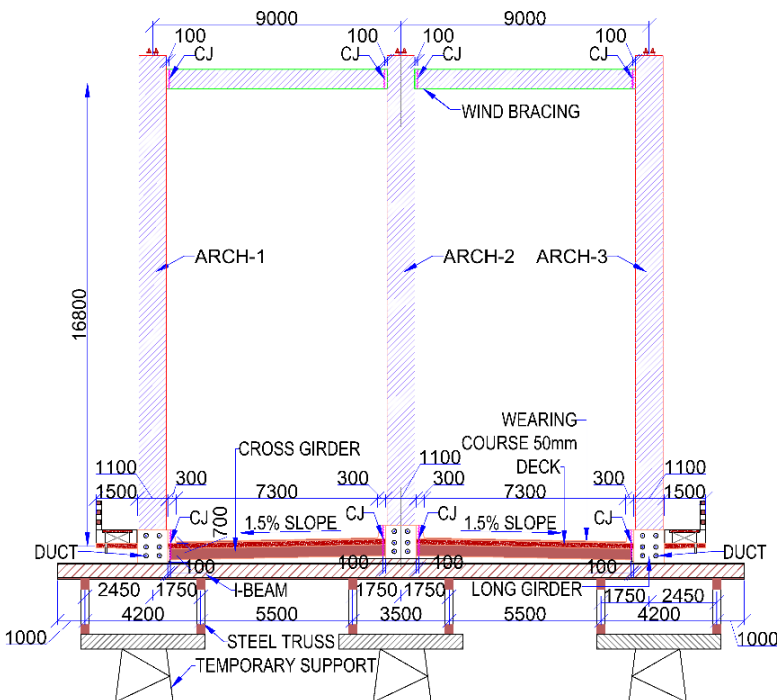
Cross section of formworks on 30m span truss with construction joints (CJ).
